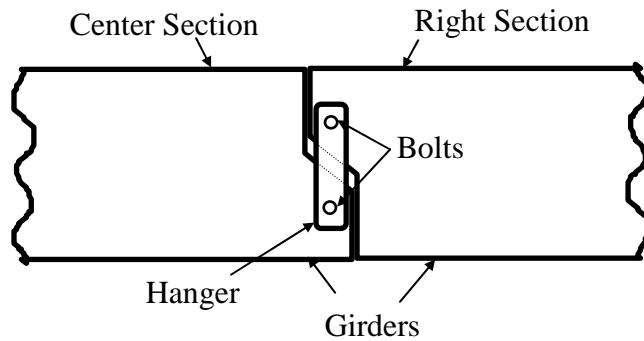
Details of the hanger joint for the Center/Right Section joint (the Center/Left Section is similar)
